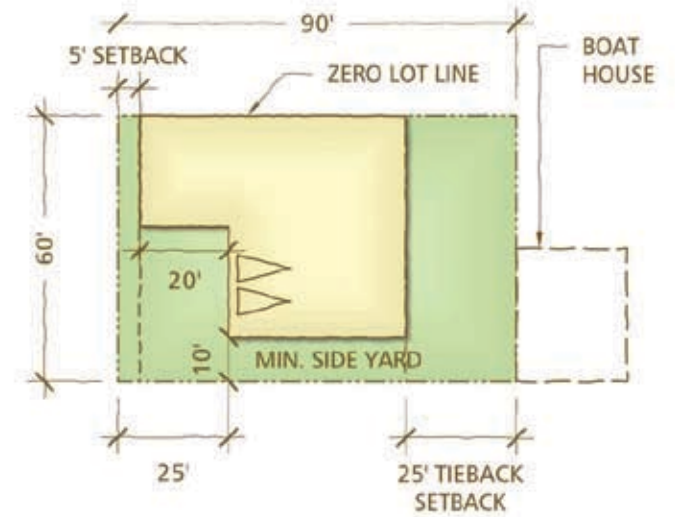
(B): Typical Section 1 Lots 12-70
